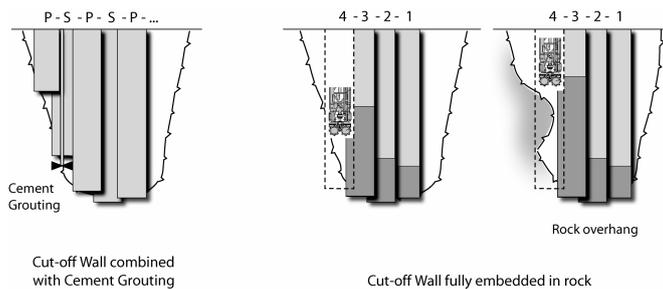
Previous design of cut-off wall and special proposal by BAUER
